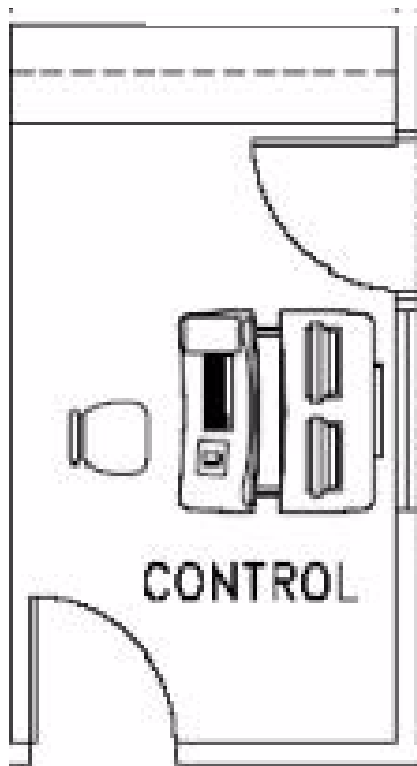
Minimum Dimensions for Room Layout with the door on the tube exchange side of the room
